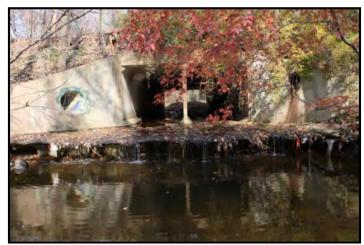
Downcutting and a large scour pool at the Queensberry Avenue culvert
